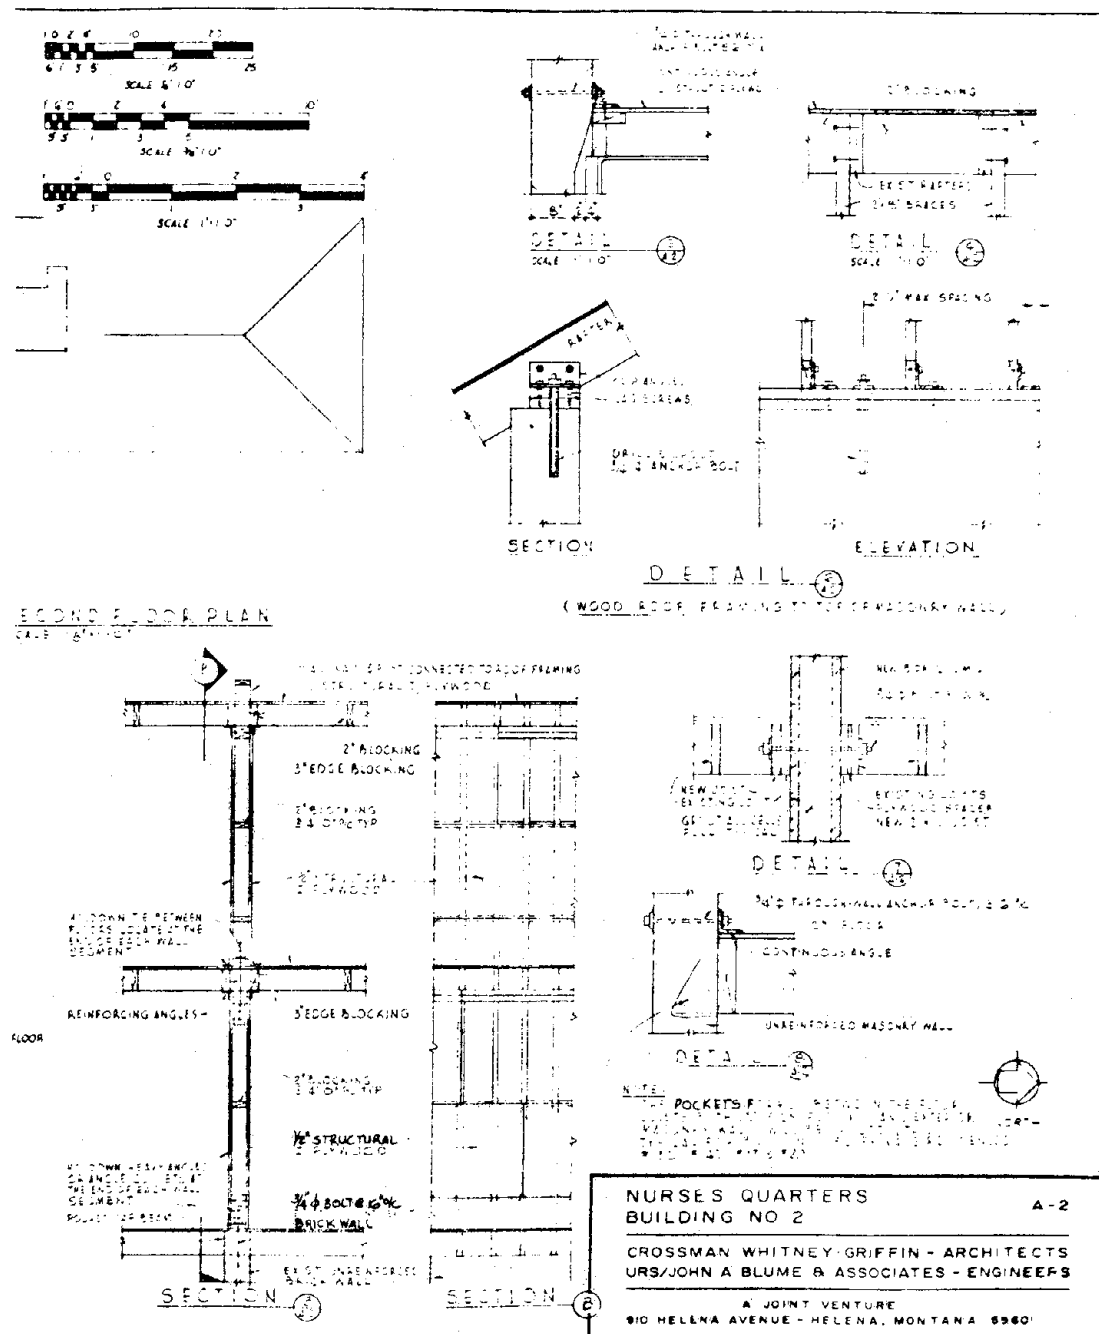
Earthquake Reinforcing for a Masonry Bearing Wall Building with Wood Floors
